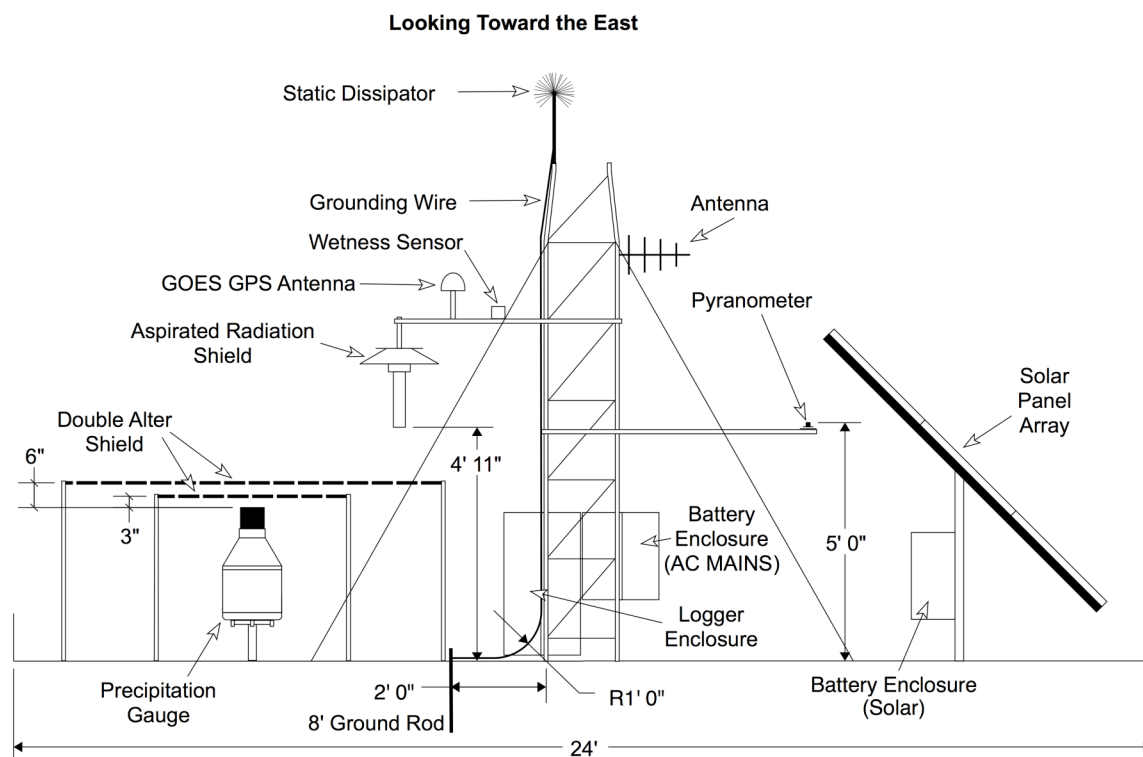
Profile view of a station plot that measures 24-by-24 feet and has a 3-meter tower.
